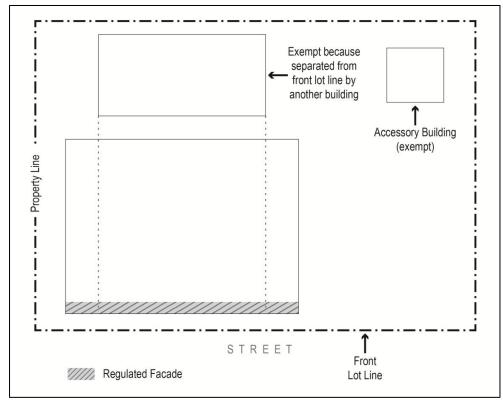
Regulated façades for Façade Design, Articulation and Window Standards.
